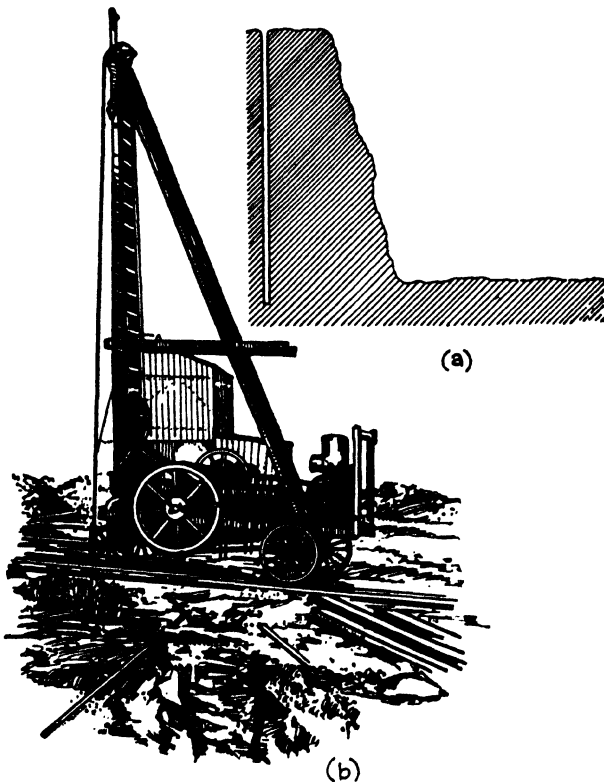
Well Drilling. (a) section of drill hole; (b) drilling rig.
